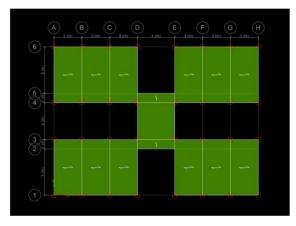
Plan of G+20 story CFST building (22 m x 16 m)
